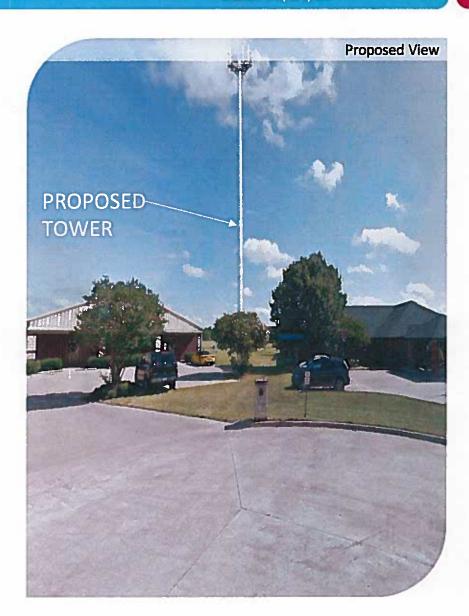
NORTHEAST OF PROPOSED POLE FROM MARKET PLACE BLVD
